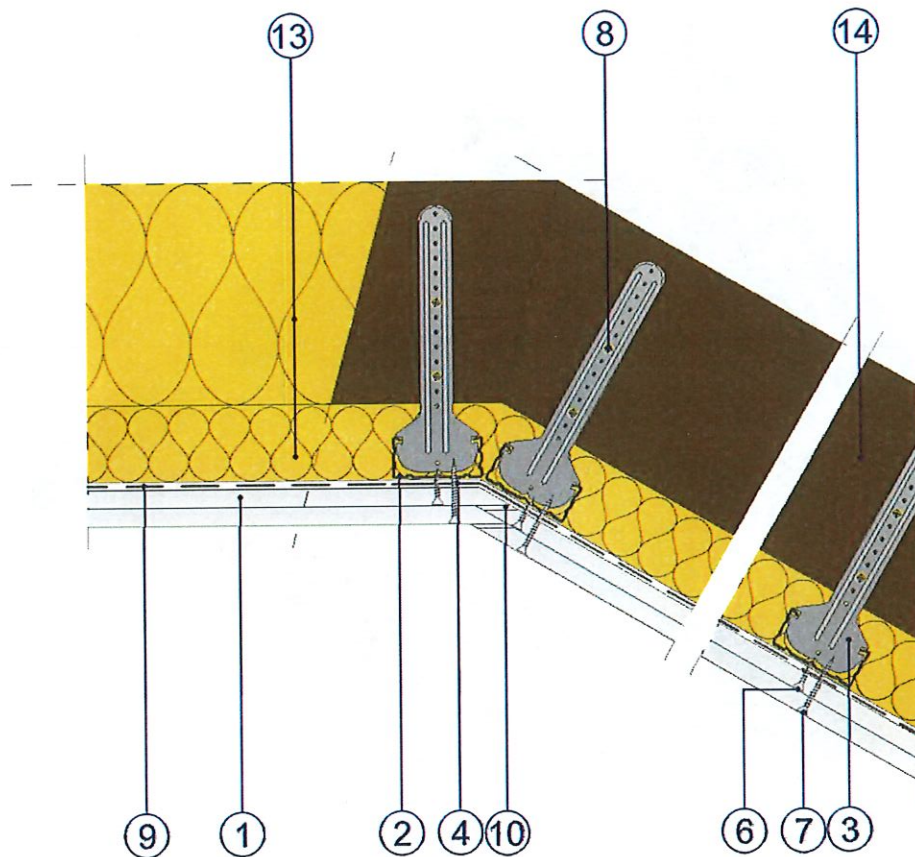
Horizontal section of the roof casing with the framework made of profiles CD 60 and hangers ES or ES plus
